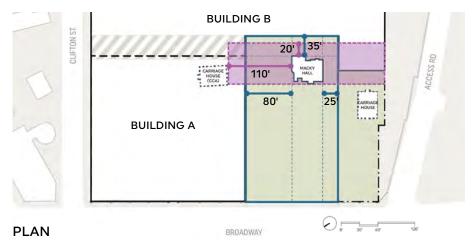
Reduced height zone west elevation of and adjacent to Macky Hall
